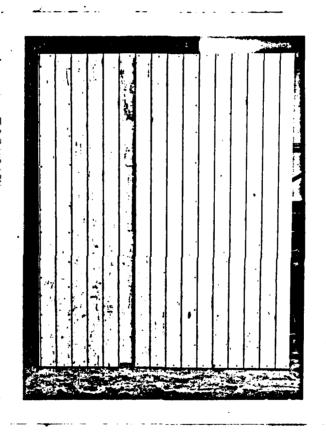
Texture 1-11 Plywood Siding on Wood Frame Wall Showing Exterior Side.
